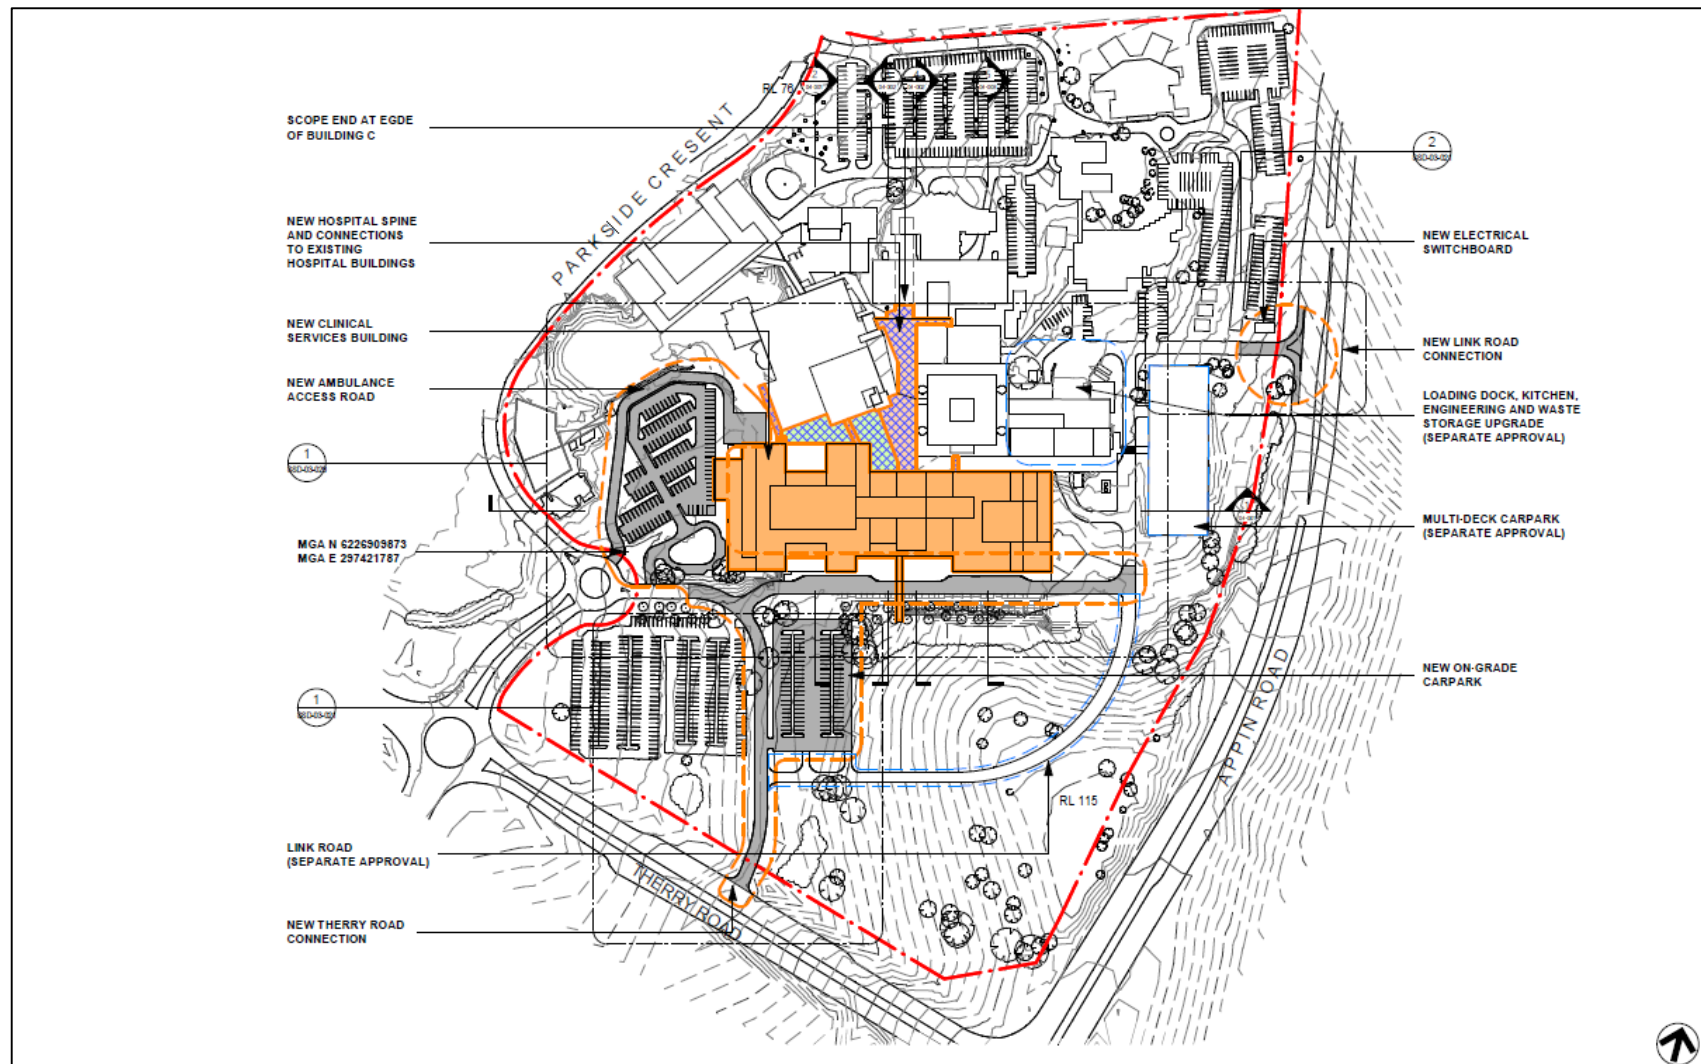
Plan – site plan proposed works (Billard Leece Partnership Pty Ltd, SSD-01-003, Rev J)
